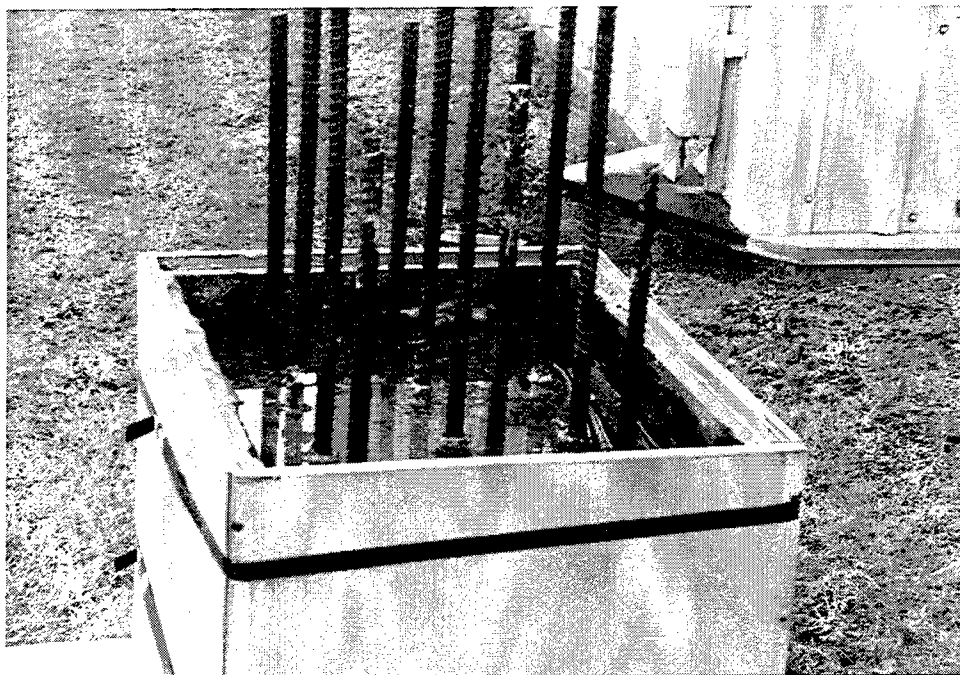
Typical fabricated concrete blocks for submerged anchor installations
